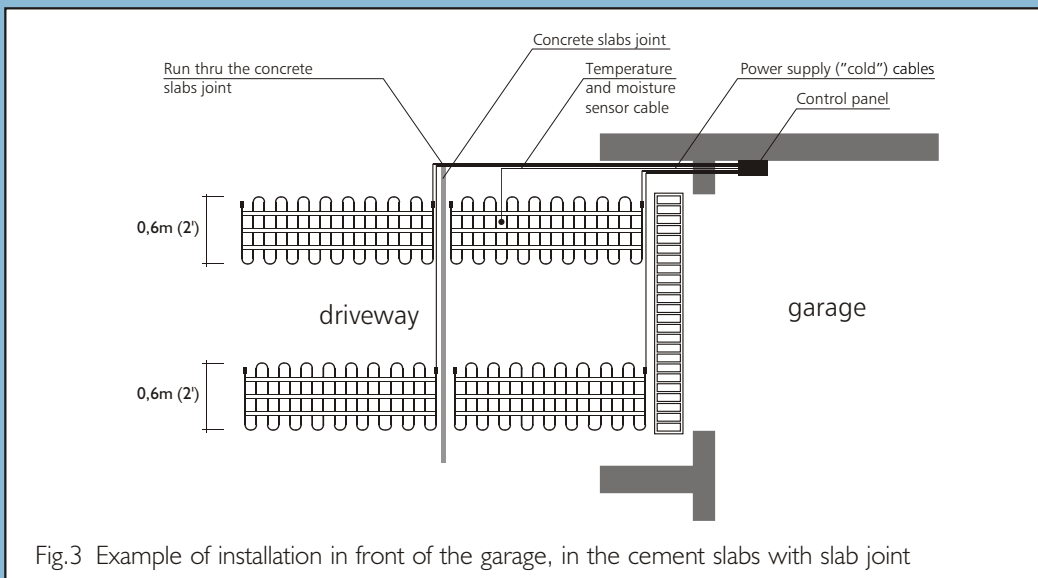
Example of installation in front of the garage, in the cement slabs with slab joint
